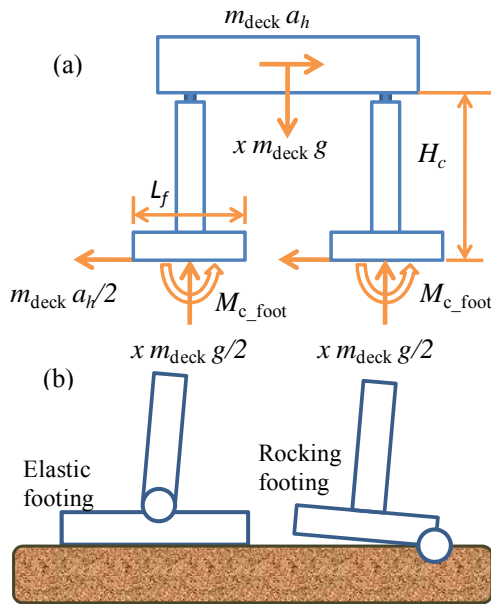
(a) Free body diagram of loads on a bridge bent with pins at the column-deck connection. (b) Simplified systems with plastic hinging at the base of the column and hinging due to local yielding of the soil near the toe of a rocking footing.
